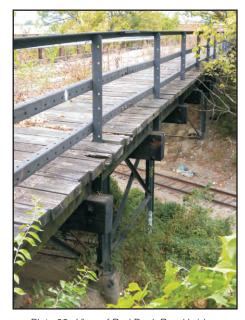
View of Red Bank Road bridge, currently closed, facing northwest.
